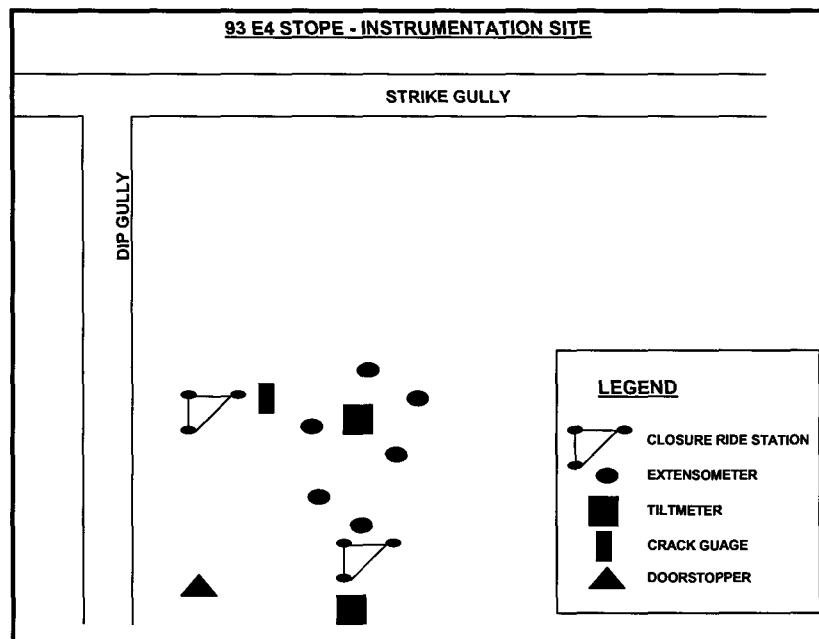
Layout of continuous monitoring instrumentation.
